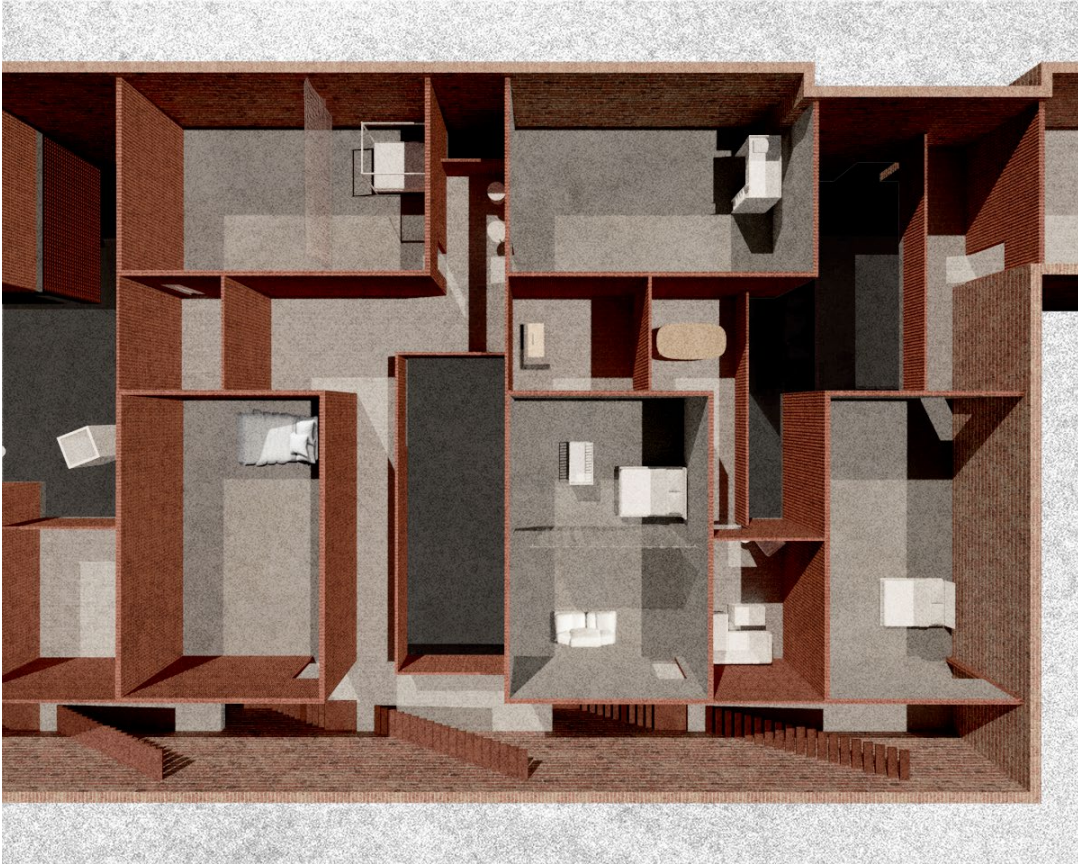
Floorplan perspective of second floor, with housing connected by collective dining and living spaces.
